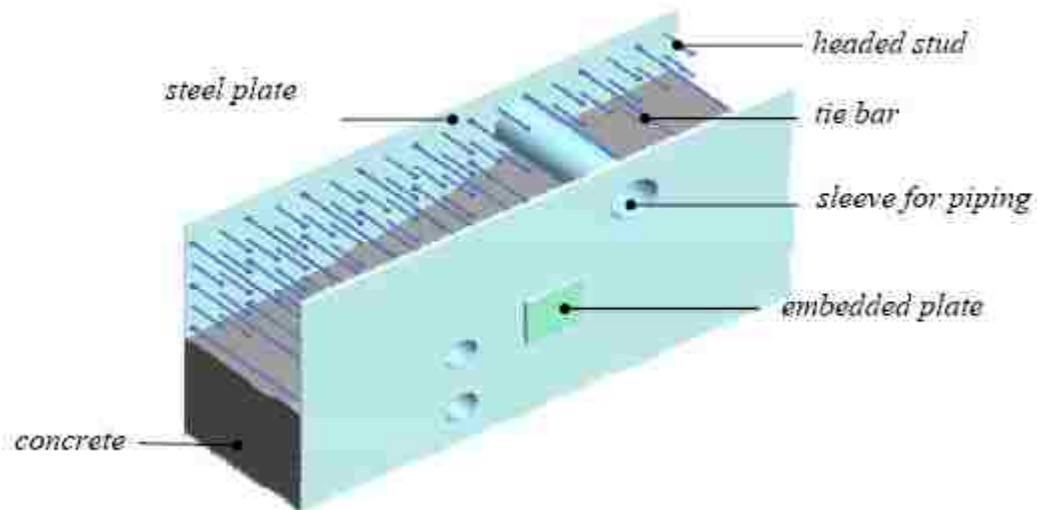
Internal arrangement of a typical Steel-Plate Concrete Composite Structure, also known as a Steel Concrete Composite Structure (U.S. Department of Energy)
